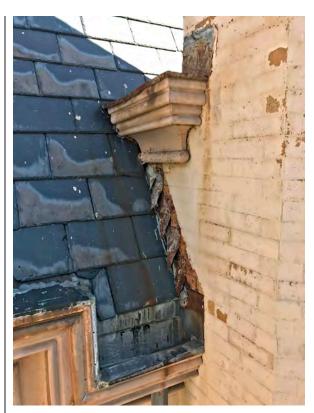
Example photo of deteriorated built-in gutter liner, wall flashing and cap flashing at Borough Hall. Taken from south elevation.
